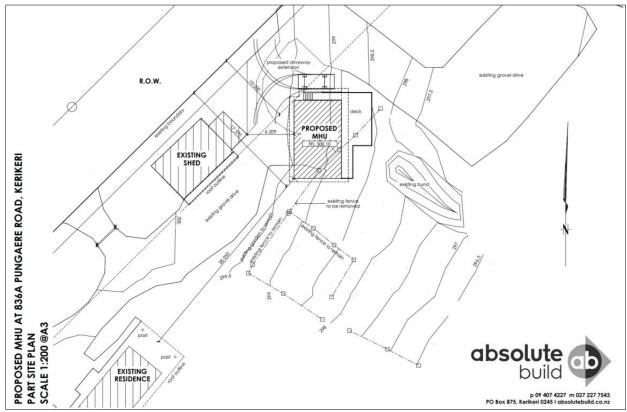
Screenshot of the Partial Site Plan from the supplied architectural drawings.
